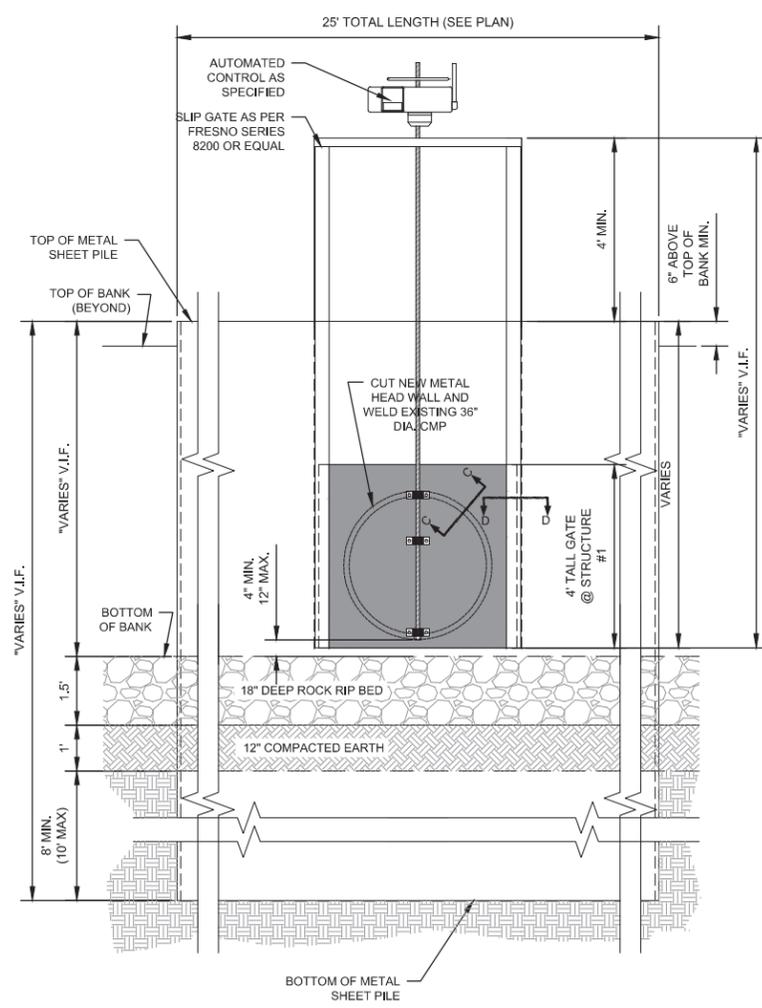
DETAIL E - TYPICAL METAL SHEET PILE HEAD WALL - SECTION
